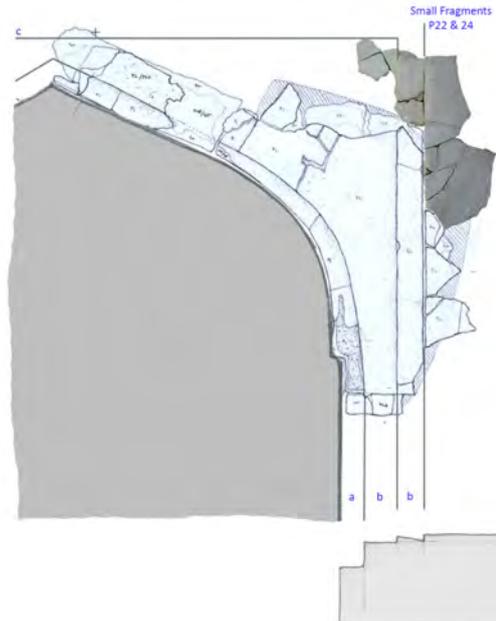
Design detail of arch opening showing rebates with small fragments.
